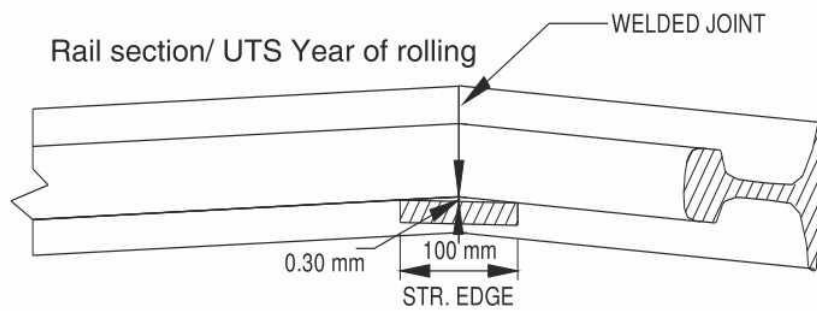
(c) Tolerance for Finishing on Sides of Head of Welded Joint
